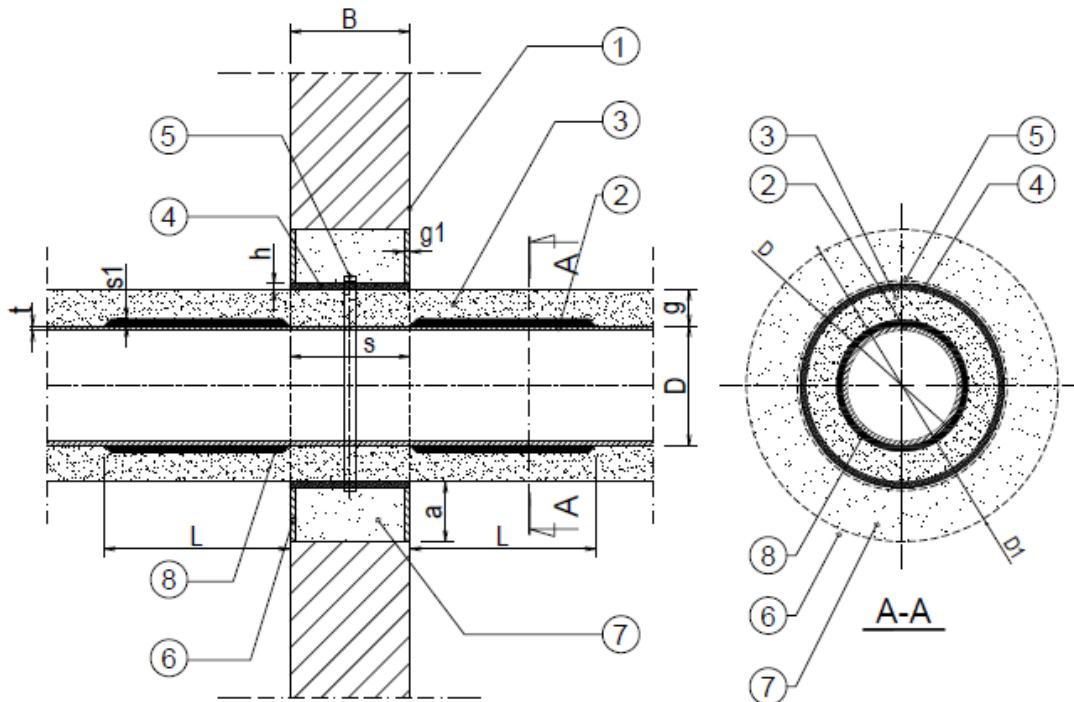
Metal pipes penetration seals in rigid wall, made with use of PIRO Multitube PM (with flexible elastomeric foam (FEF) insulation).
